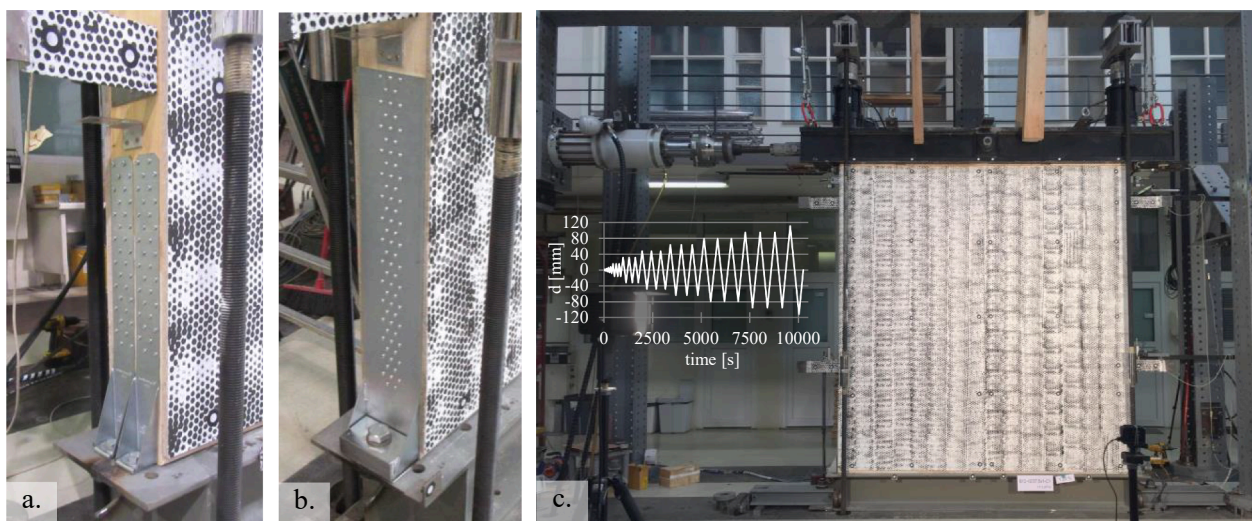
a. Standard hold-downs to anchor weaker panels; b. Stronger hold-down to anchor the strengthened panels; c. Test setup for shear tests on the wall panels with cyclic tests loading time history.
